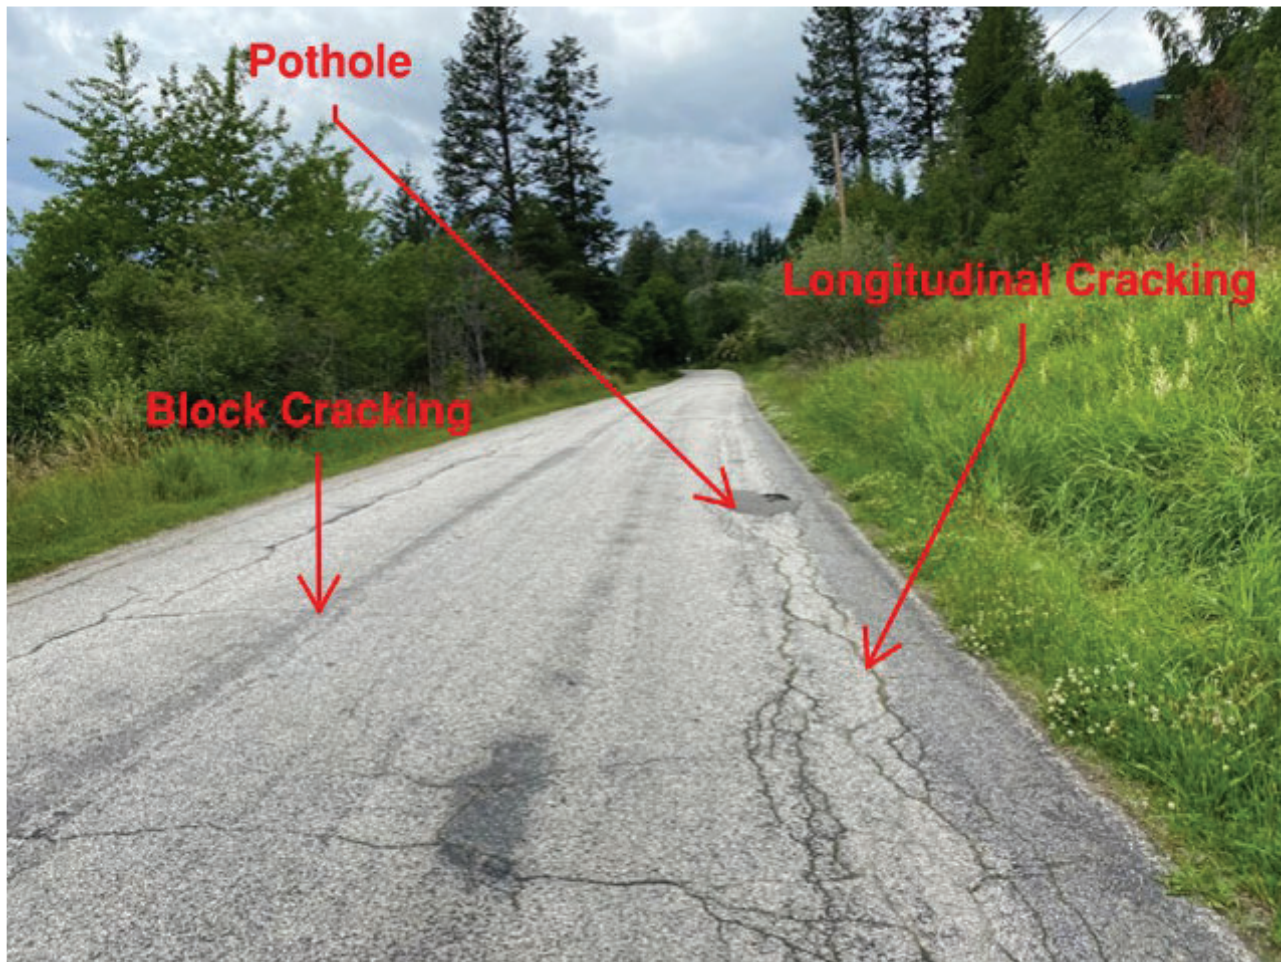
Denton and Wellington, Longitudinal (Right) and Block Cracking (Left) , Pot Hole (Right)
